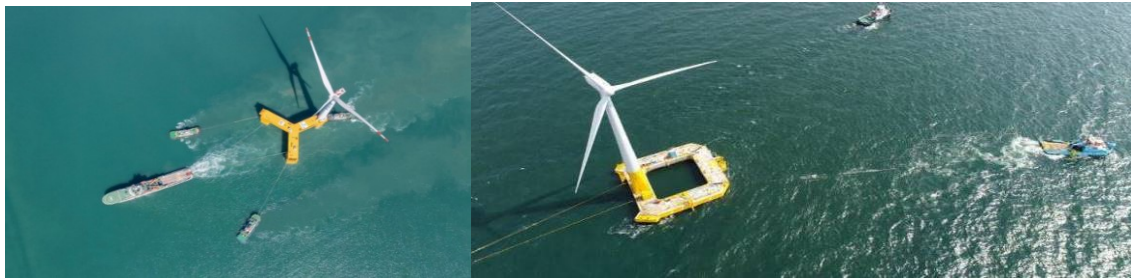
Wet tow of semi-submersible, ref [13] and damping barge ref[10]
